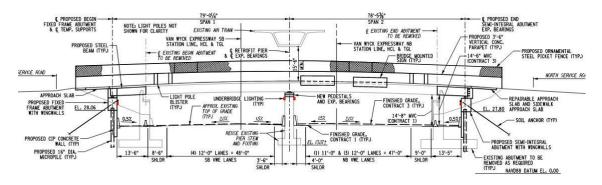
Proposed elevation view of the 109th Avenue Bridge over Van Wyck Expressway.
